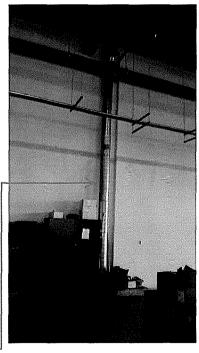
1207 Canal; typical warehouse space return air duct to roof air exchanger, column G9.
